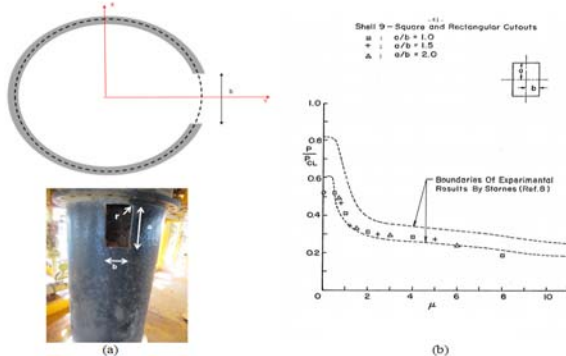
(a) Typical section damage, and (b) Collapse capacity [7]
